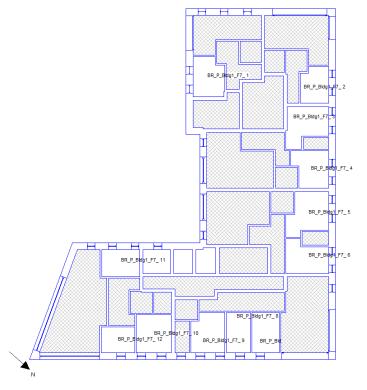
Level 7 bedrooms in Building 1 (larger plan in Appendix A)
